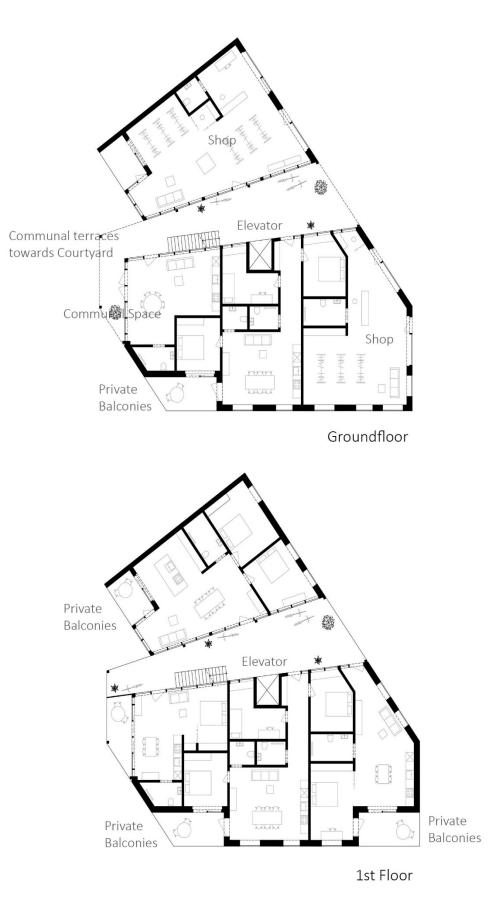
Floorplans of addition at Tagensvej (1/2), Scale 1:250 (A4)
